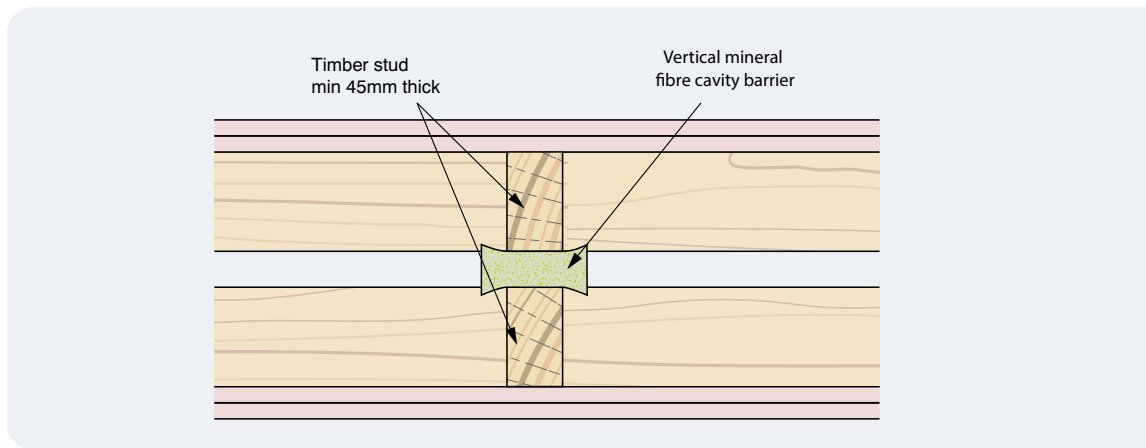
Intermediate vertical cavity barrier in double stud wall.
